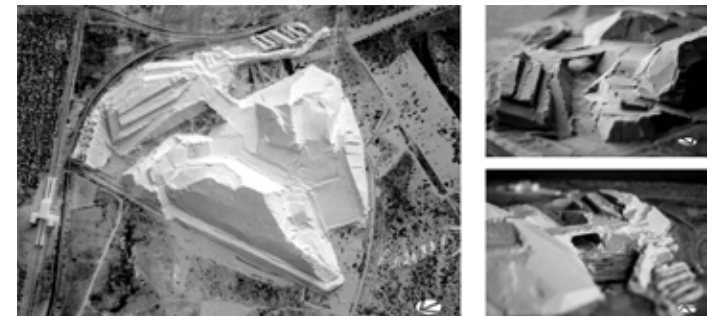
An investigation into creating a bridge to join the landfill to the living platforms in order to help the waste trucks deliver building rubble .(Author 2016)
